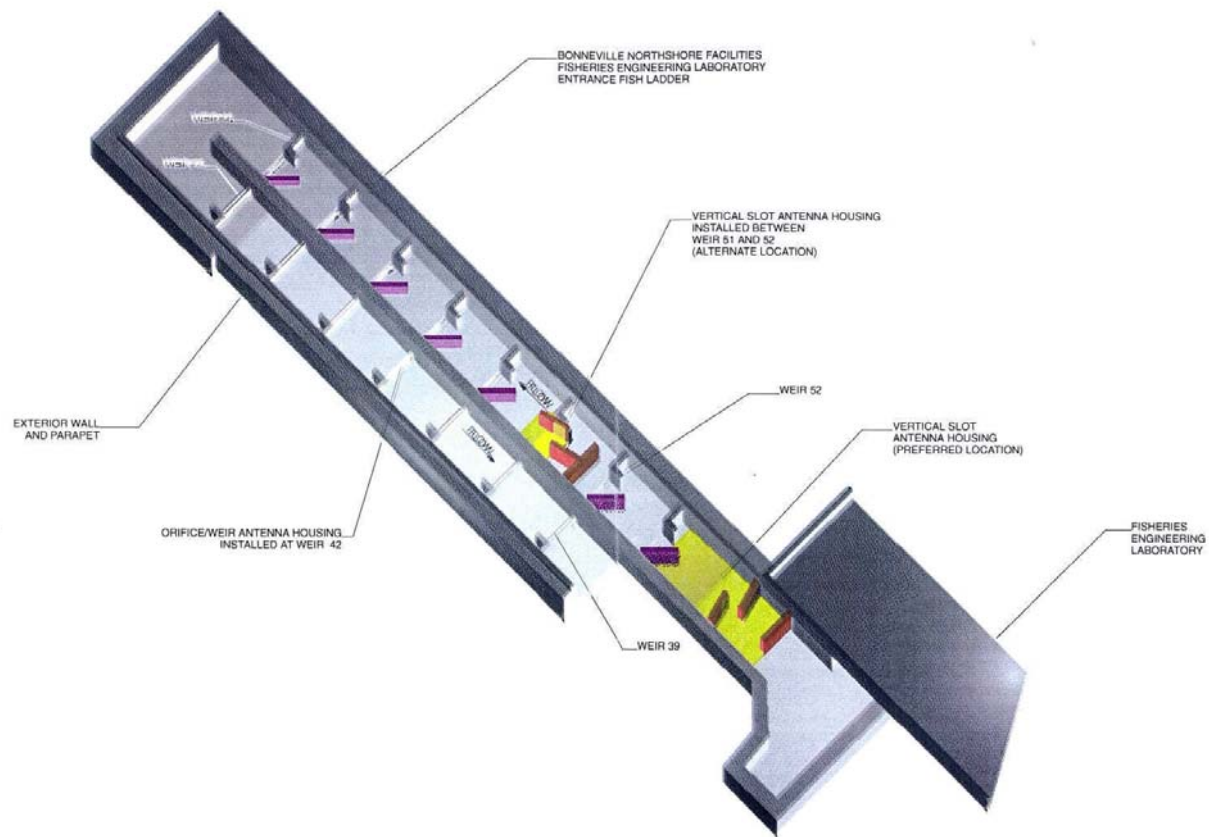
Antenna Housing Installation - Looking North from the Southwest
